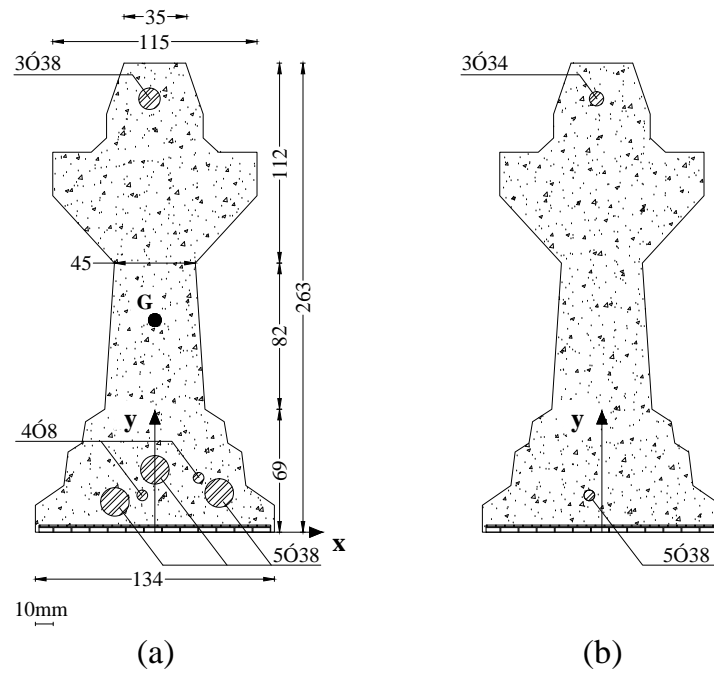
Concrete beam mid-span (a) and beam end (b) cross-sections (clay tile at the bottom) and reference system
